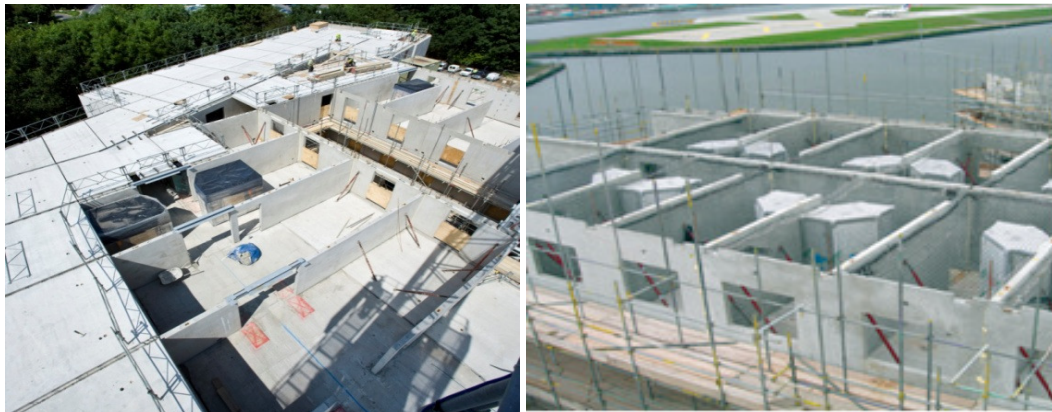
Examples of precast concrete wall construction (Courtesy of Bison Concrete)
